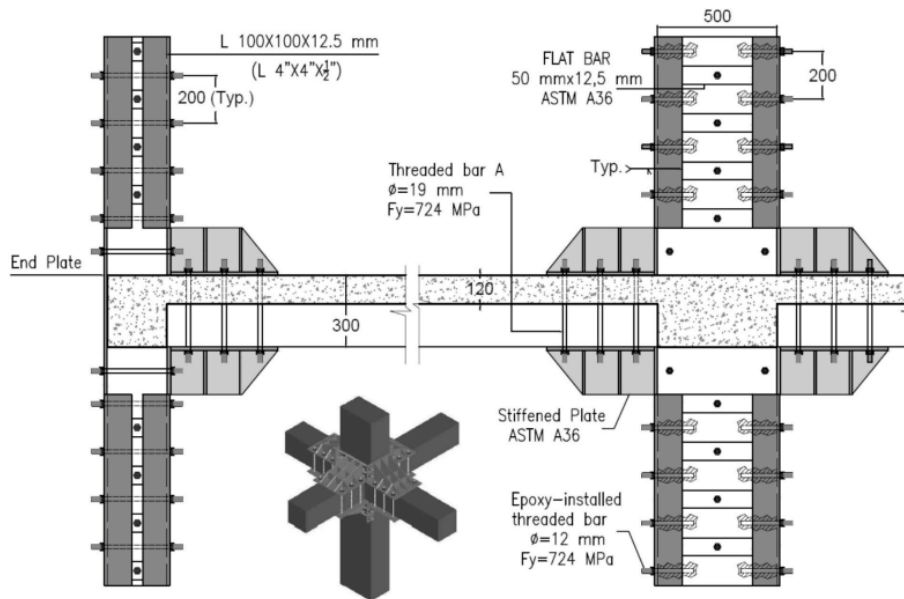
9, Retrofitting scheme for RC columns and beam-column joints.
